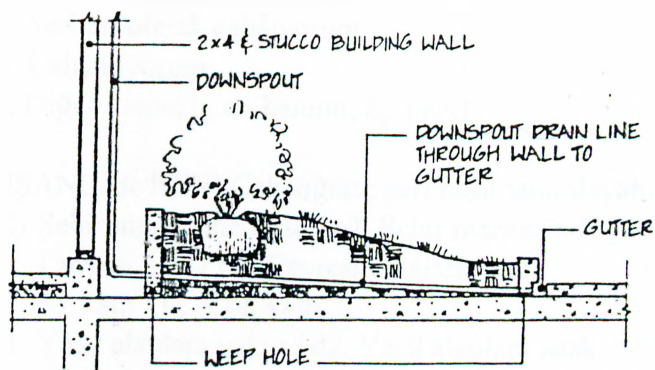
Drainage through Raised Planting Bed. Raised planting areas can be separated from a porous building wall to protect it from soil dampness. Allow clearance for repairs. Downspouts are brought through the planting bed to a walkway gutter. The back space is drained by weep holes through the drainage medium to the front gutter and/or by slope to either end of the back space.
